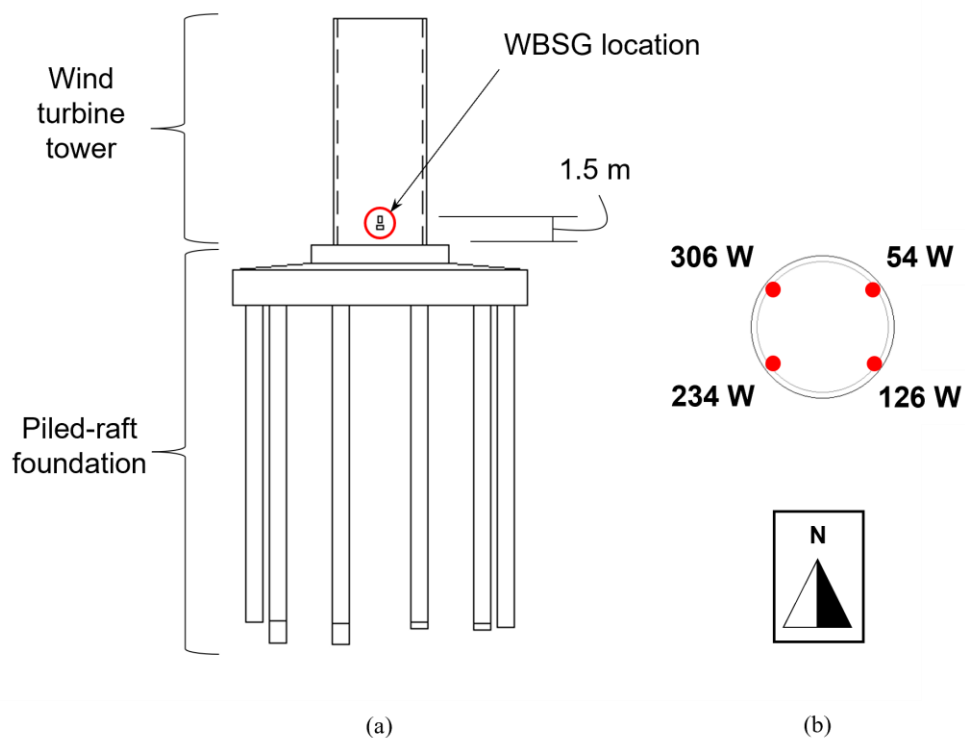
Instrumentation placement – base of the turbine tower: (a) cross-section; (b) plan view
